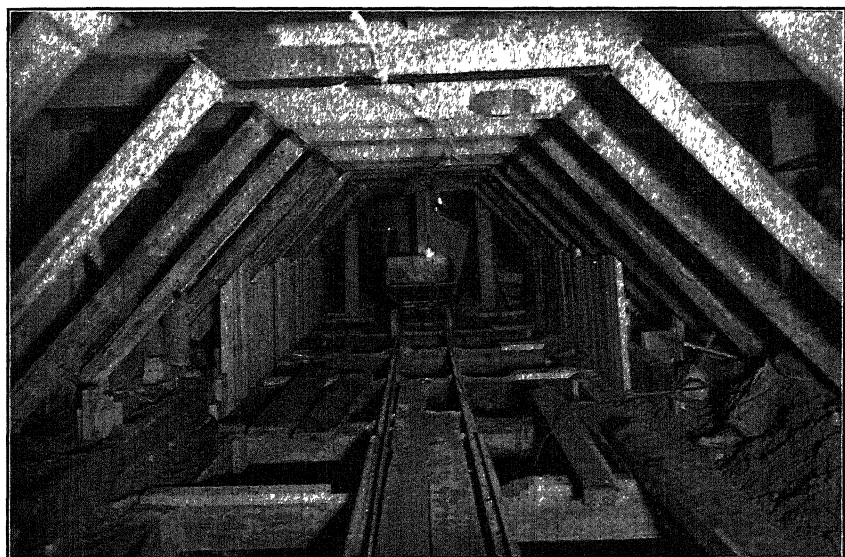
METHOD OF TIMBERING TOP HEADING AND EXCAVATING CENTER TRENCH BEFORE CONSTRUCTING CONCRETE UMBRELLA SECTION.
